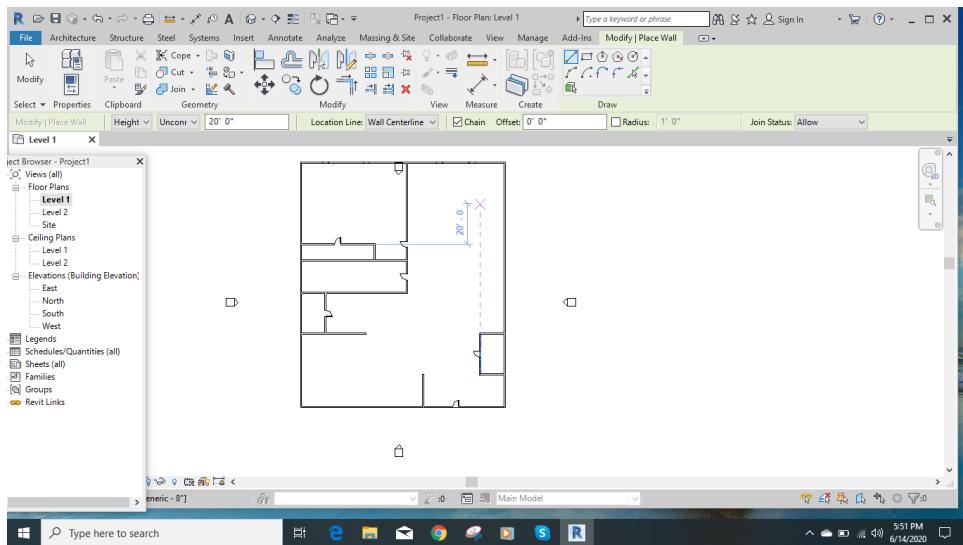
2D blueprint for a sample floor plan created in Revit.
